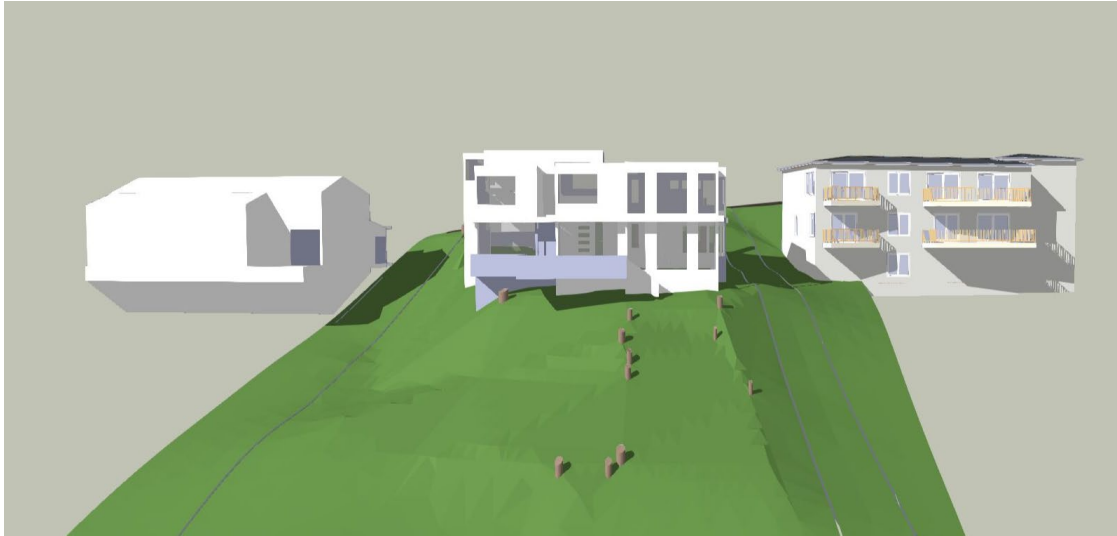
Massing at Rear Elevations (Left: 6303 Wood Dr, Center: Subject Parcel; Right: 6311 Wood Dr)
